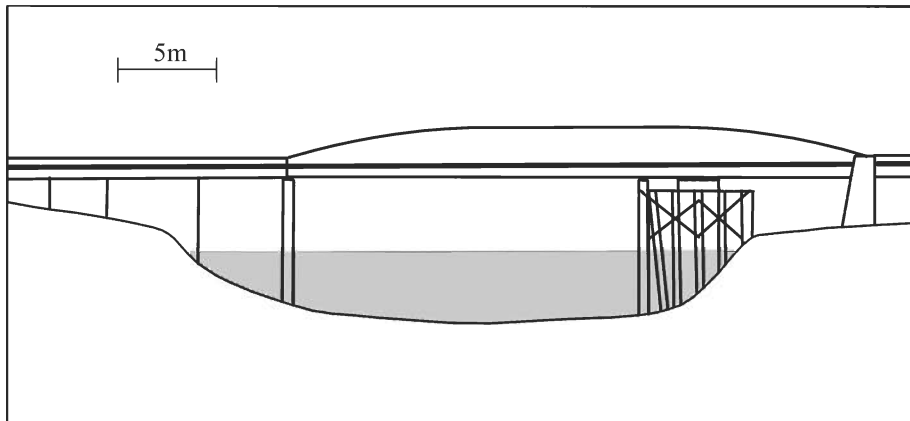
A sketch of the original railway swing bridge over the River Severn at Llanthony, based on the design drawing (now labelled GWR Drawing 17657) currently in the care of Network Rail, Swindon.
